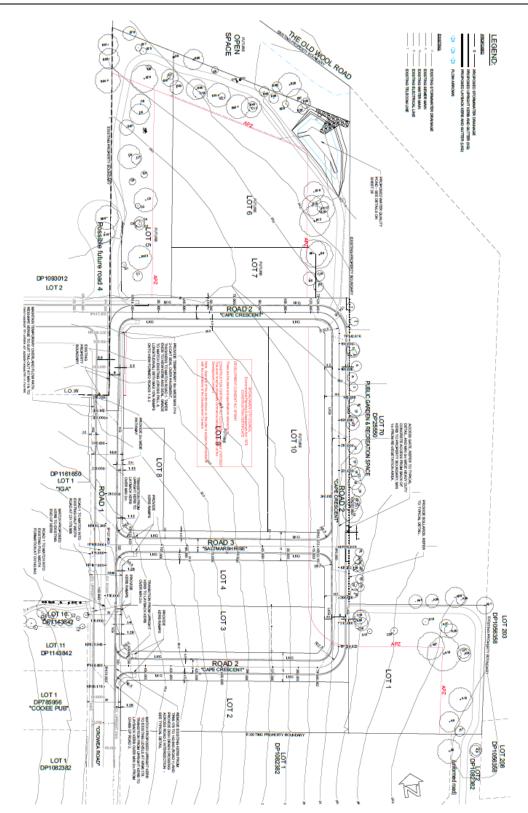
Approved subdivision layout (source: Allen Price & Scarratts, June 2020)
